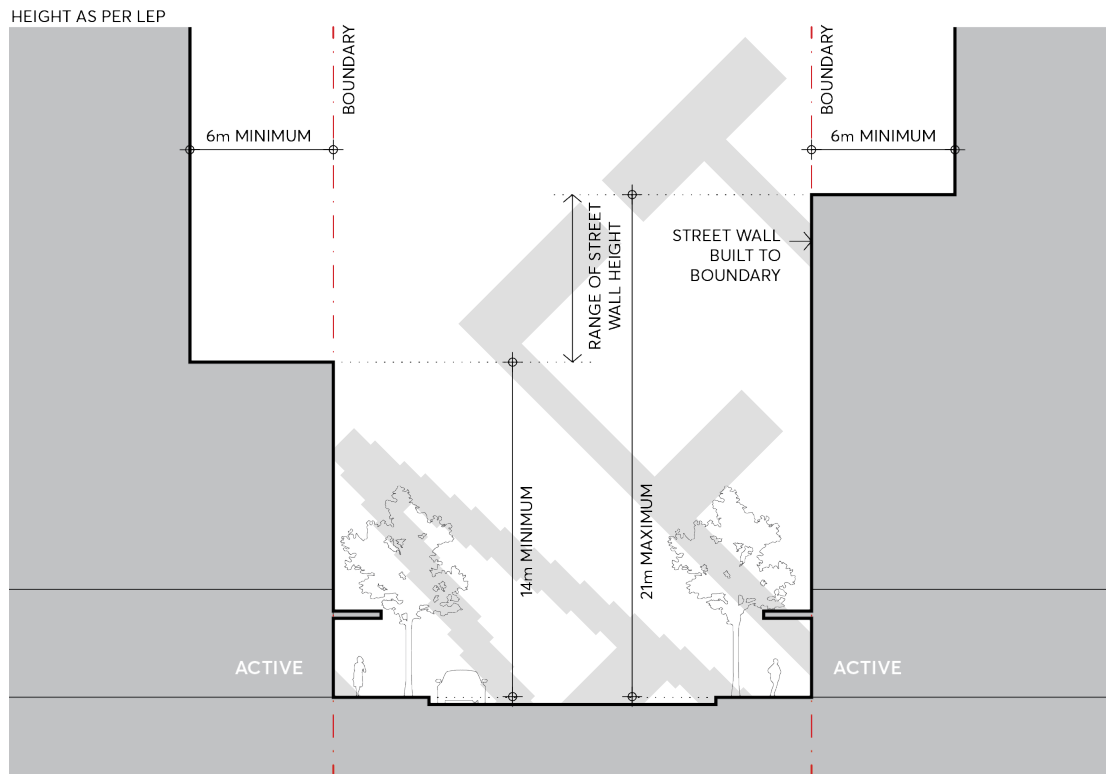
City East Block Phillip Street (Section B)
